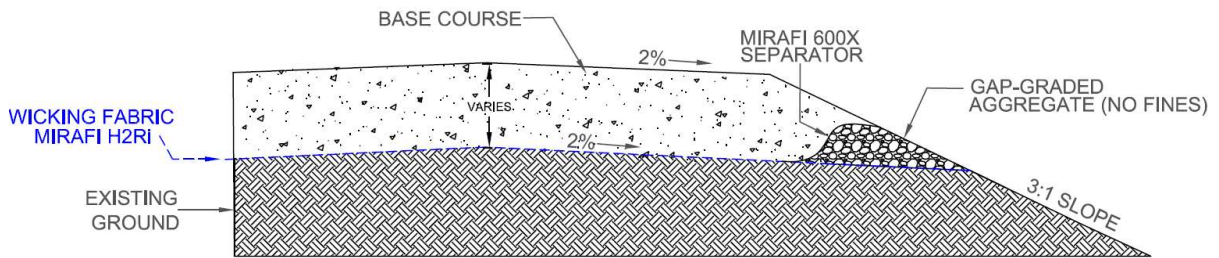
Detail of Rip Rap Protection for Daylighted Installation
